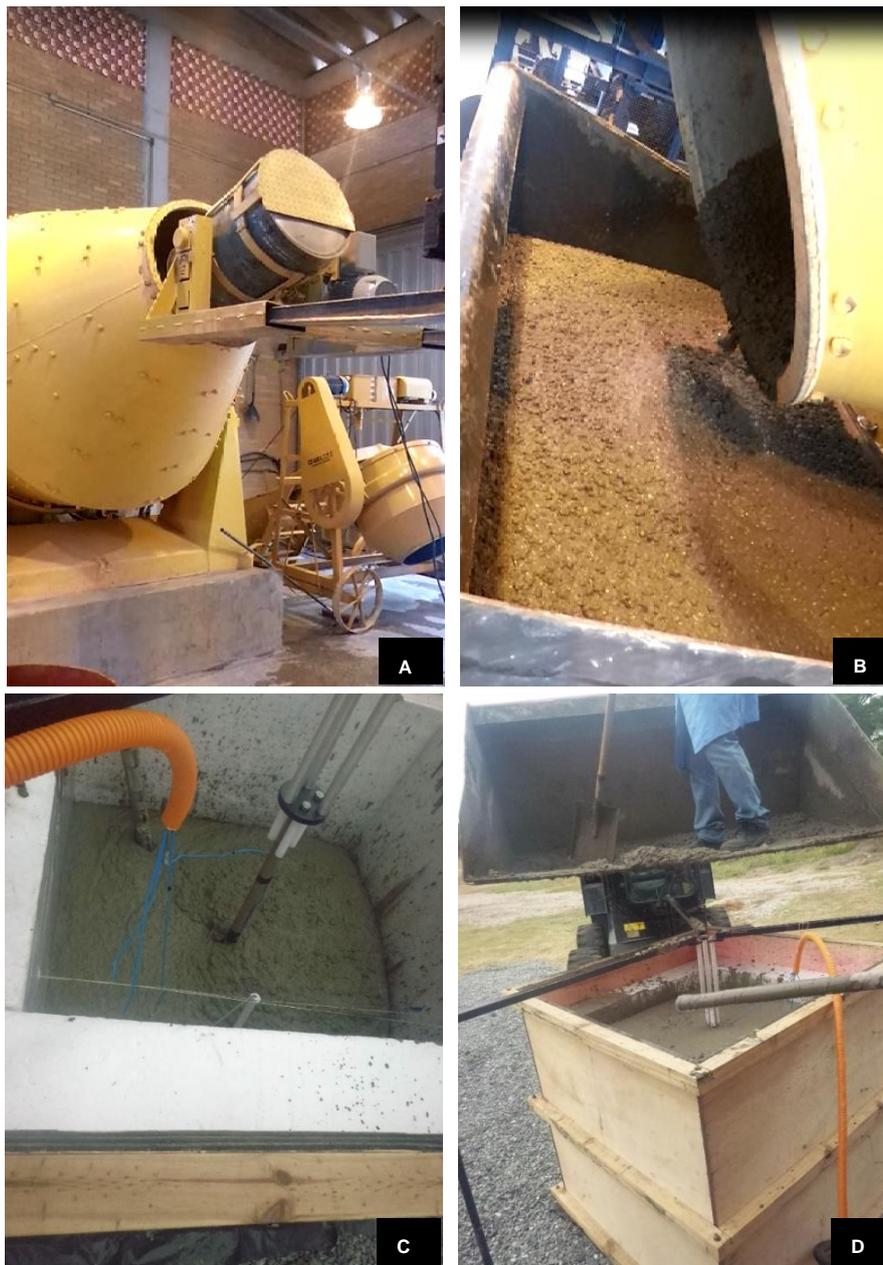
Sequence of casting and placing concrete: A) Mixer; B) Concrete aspect; C) Concrete being filled in the block, inside the polystyrene wall formwork; D) Overview of block with fresh concrete.
